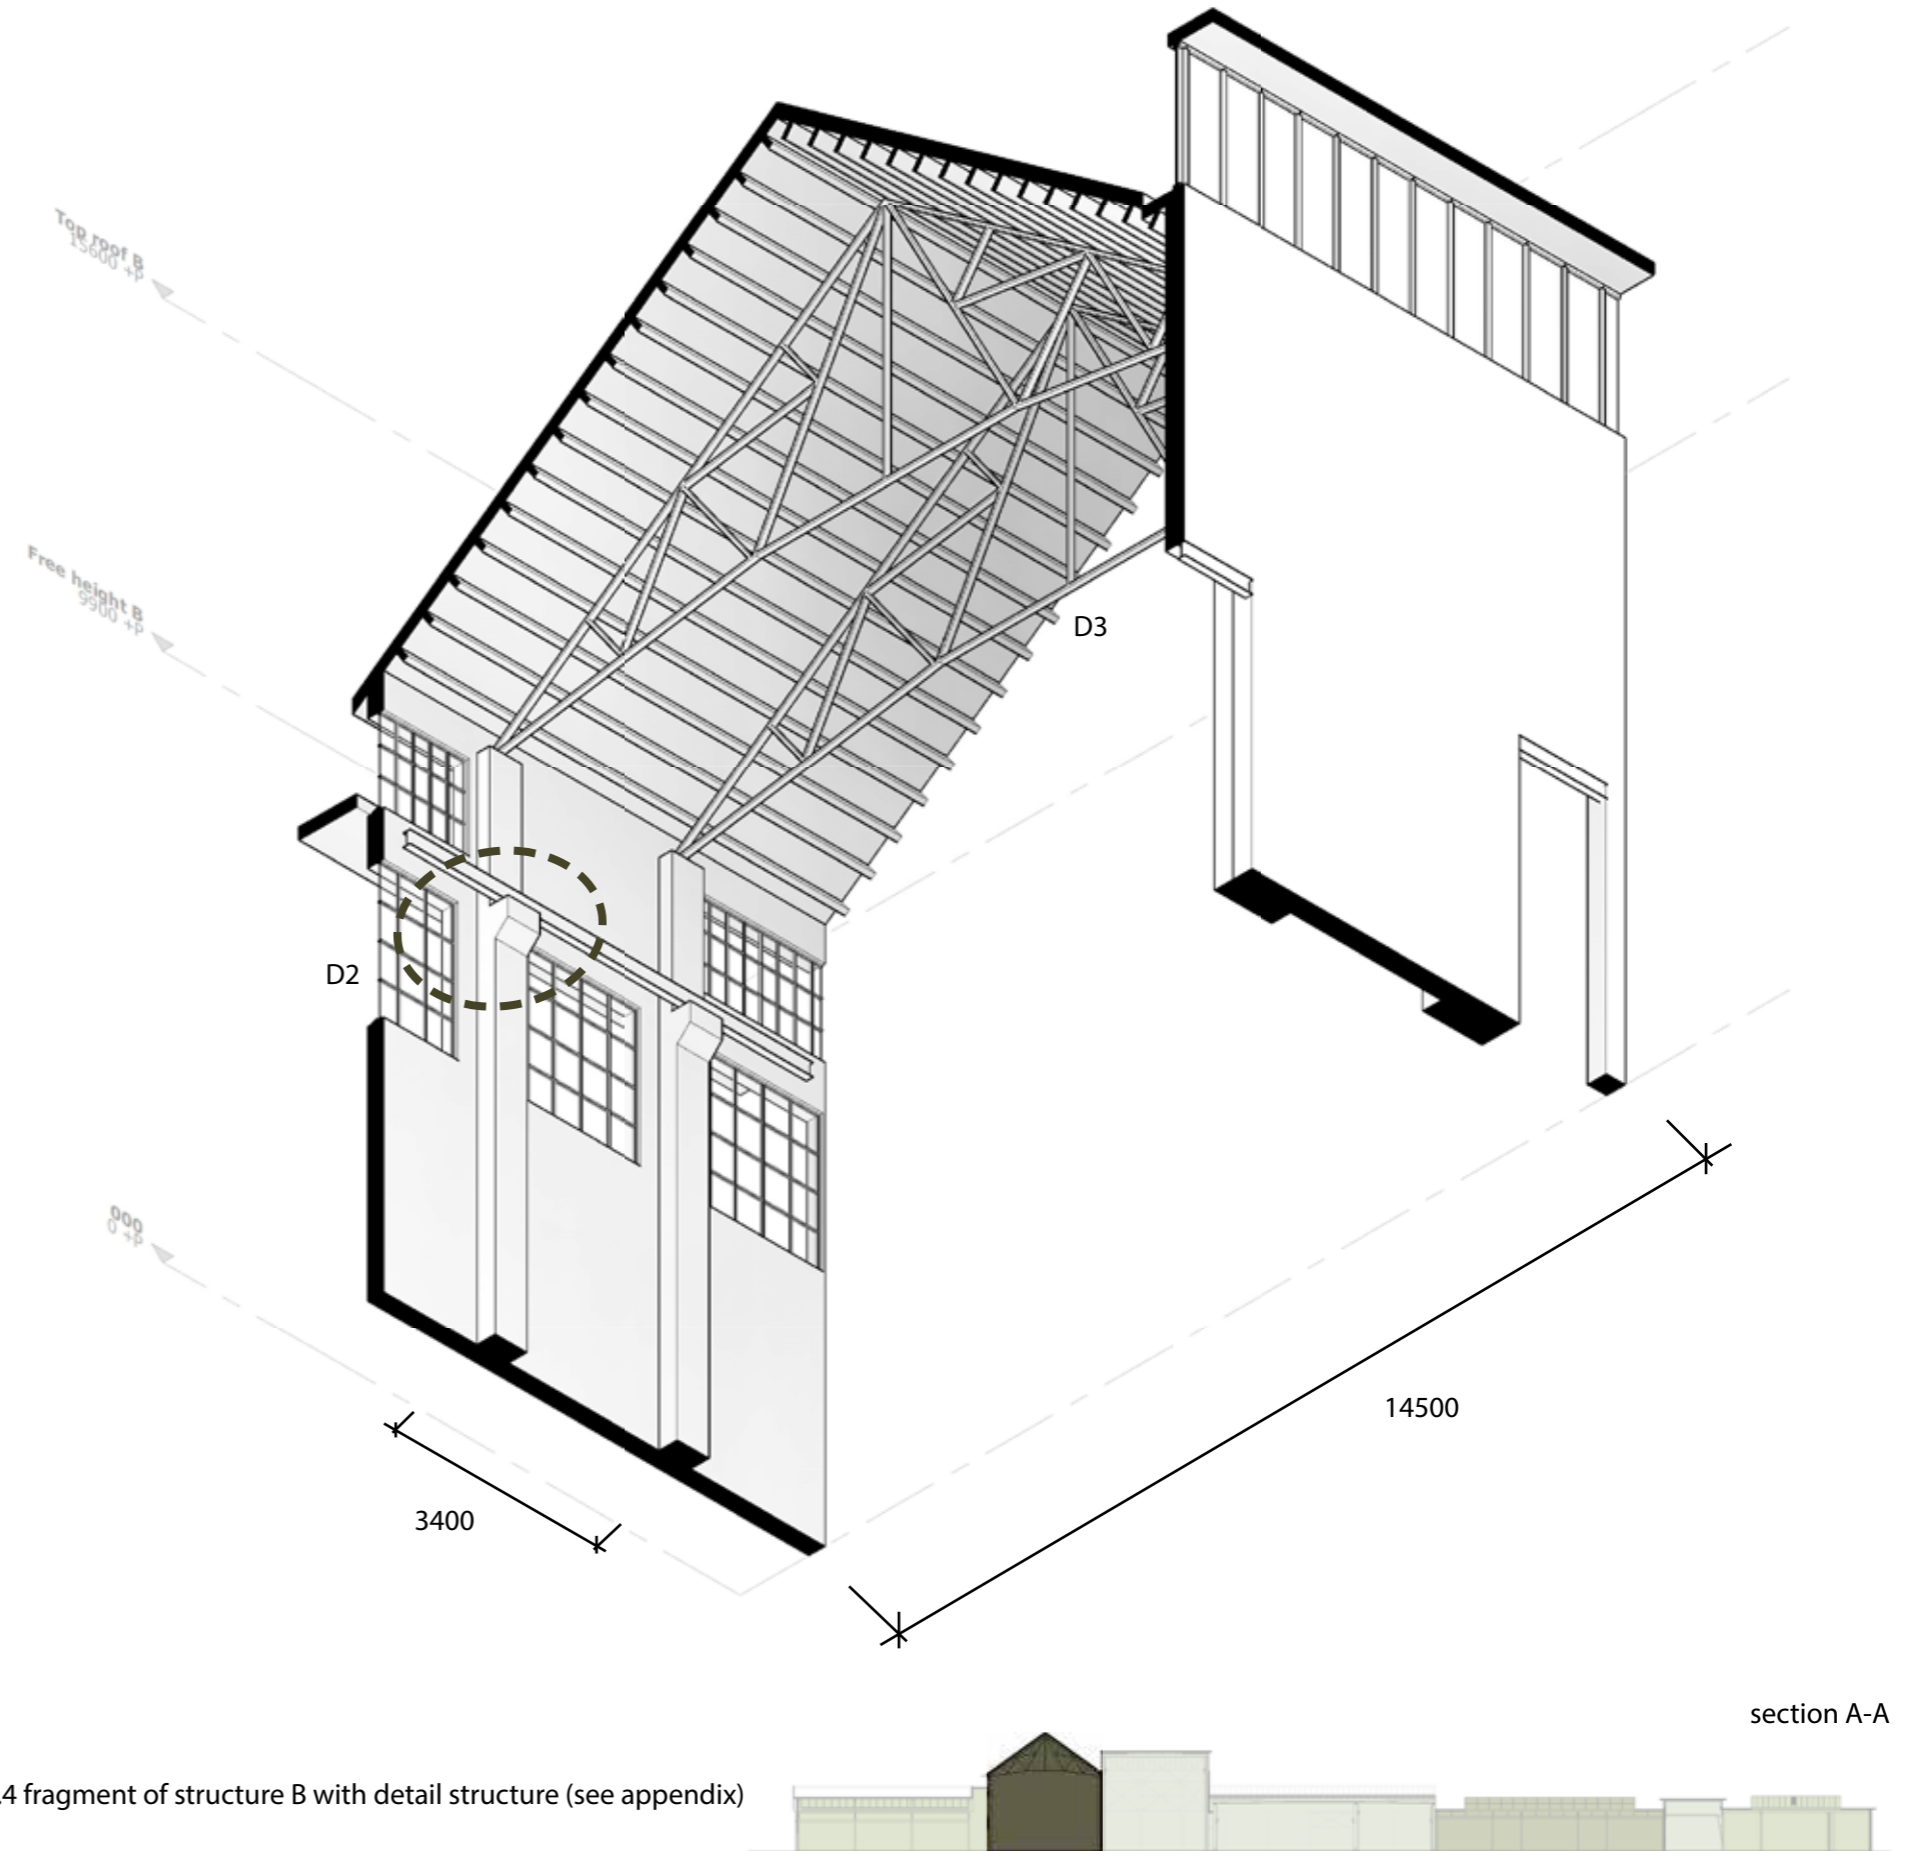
fragment of structure B with detail structure (see appendix)
